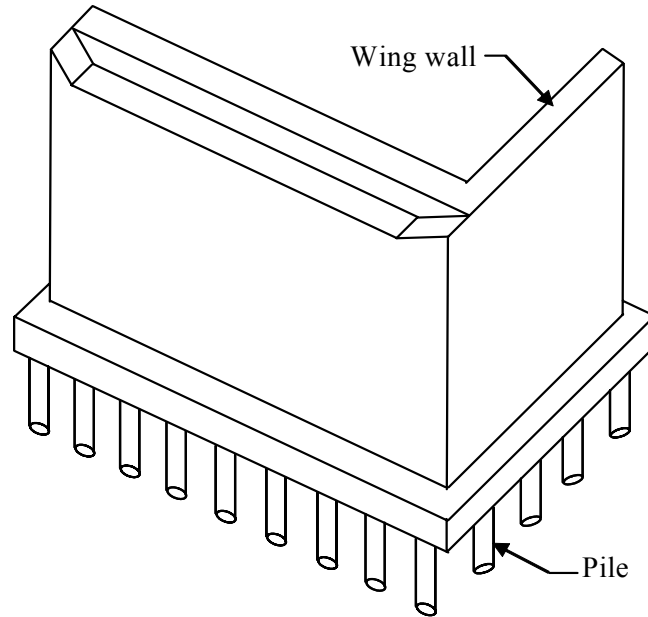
Schematic of the seat abutment used to support the right College Avenue Undercrossing Bridge.
